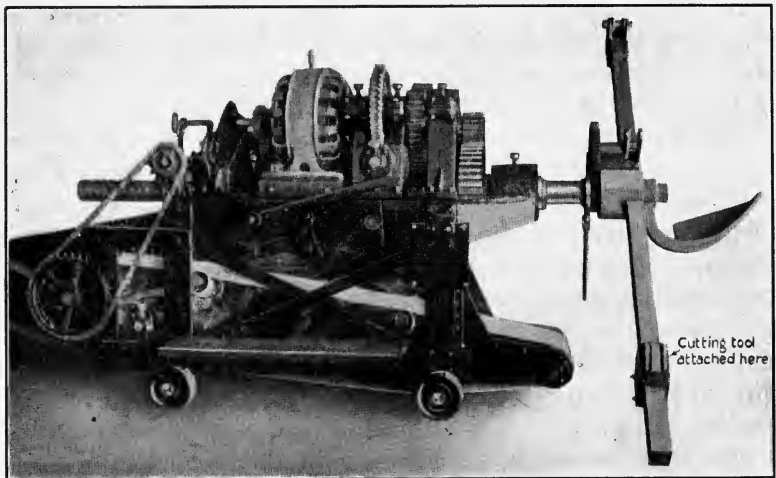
Bonnet tunneling machine. (Courtesy of *Engineering News-record.*)
